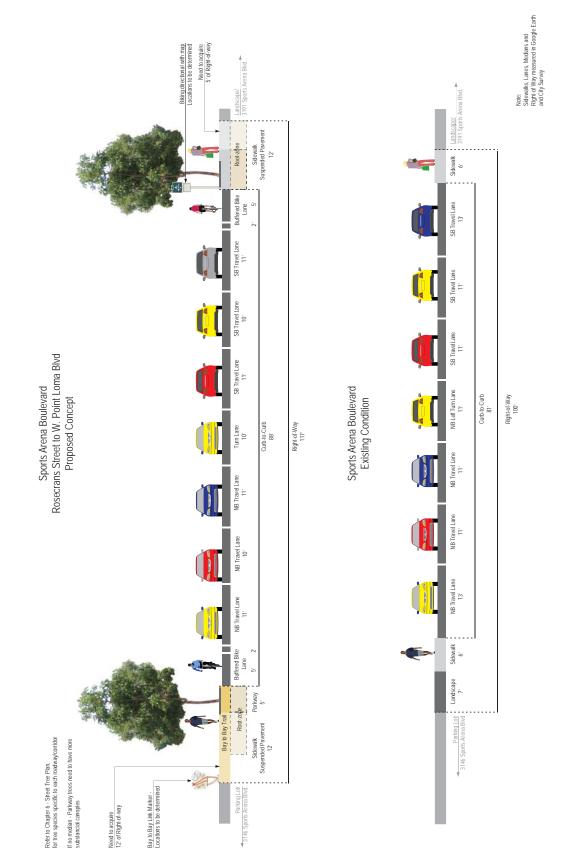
Street Concept Plan Exhibit - Sports Arena Blvd., Rosecrans St. to W. Point Loma Blvd.
